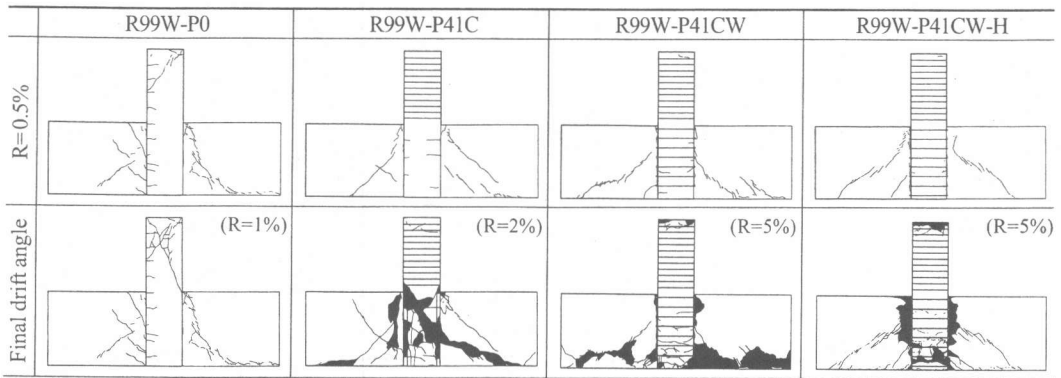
Observed cracking patterns of column specimens with spandrel walls
